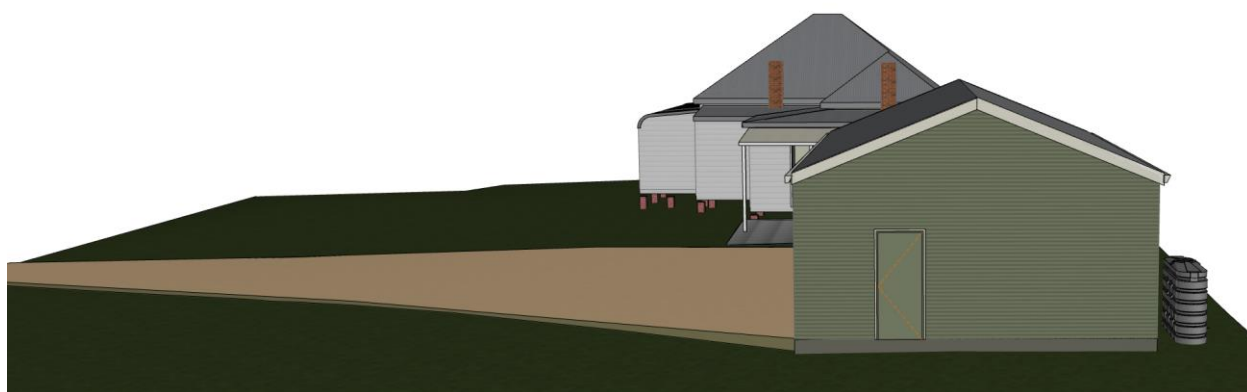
Perspective showing the proposed additions from the rear of the site.
